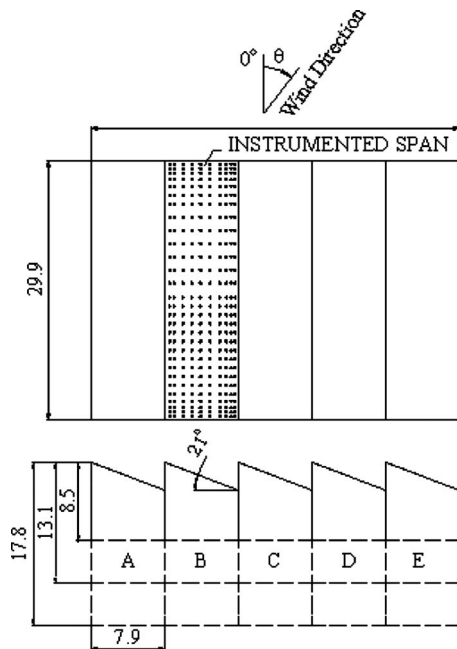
Plan and elevations of sawtooth building models (dimensions are in meters)
